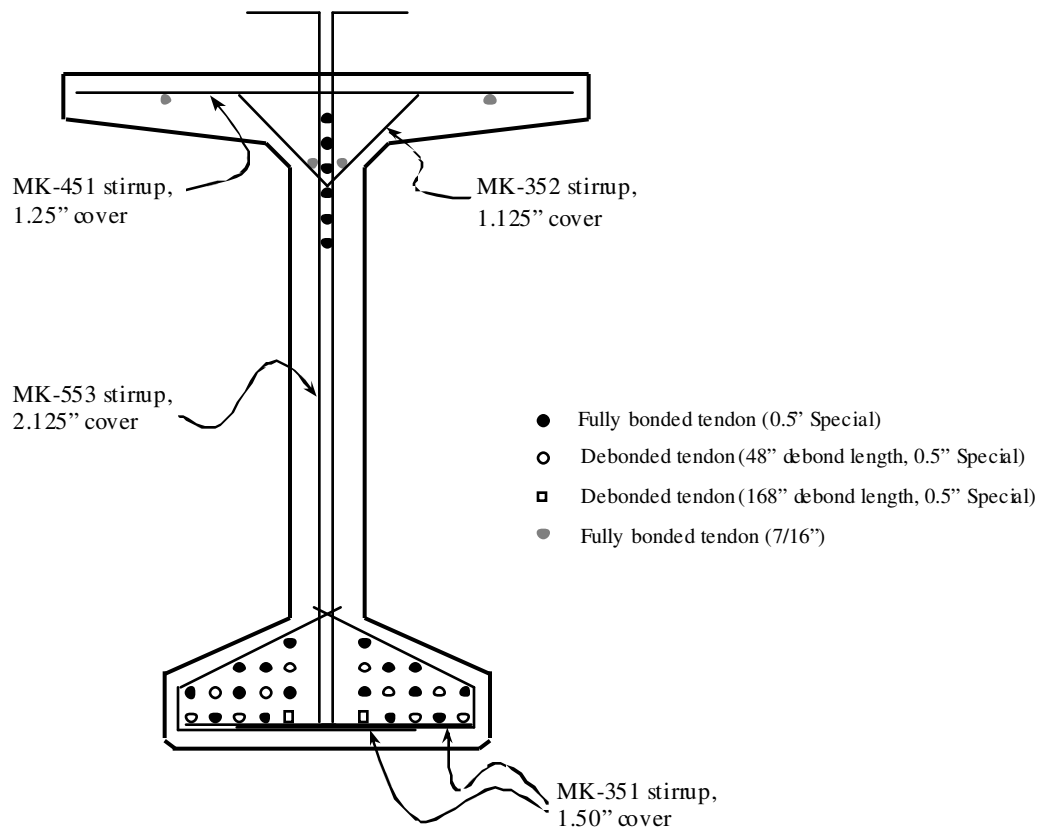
Cross-sectional Configuration of the Vertical Shear Reinforcement at the Girder End (Swenson 2003a)
